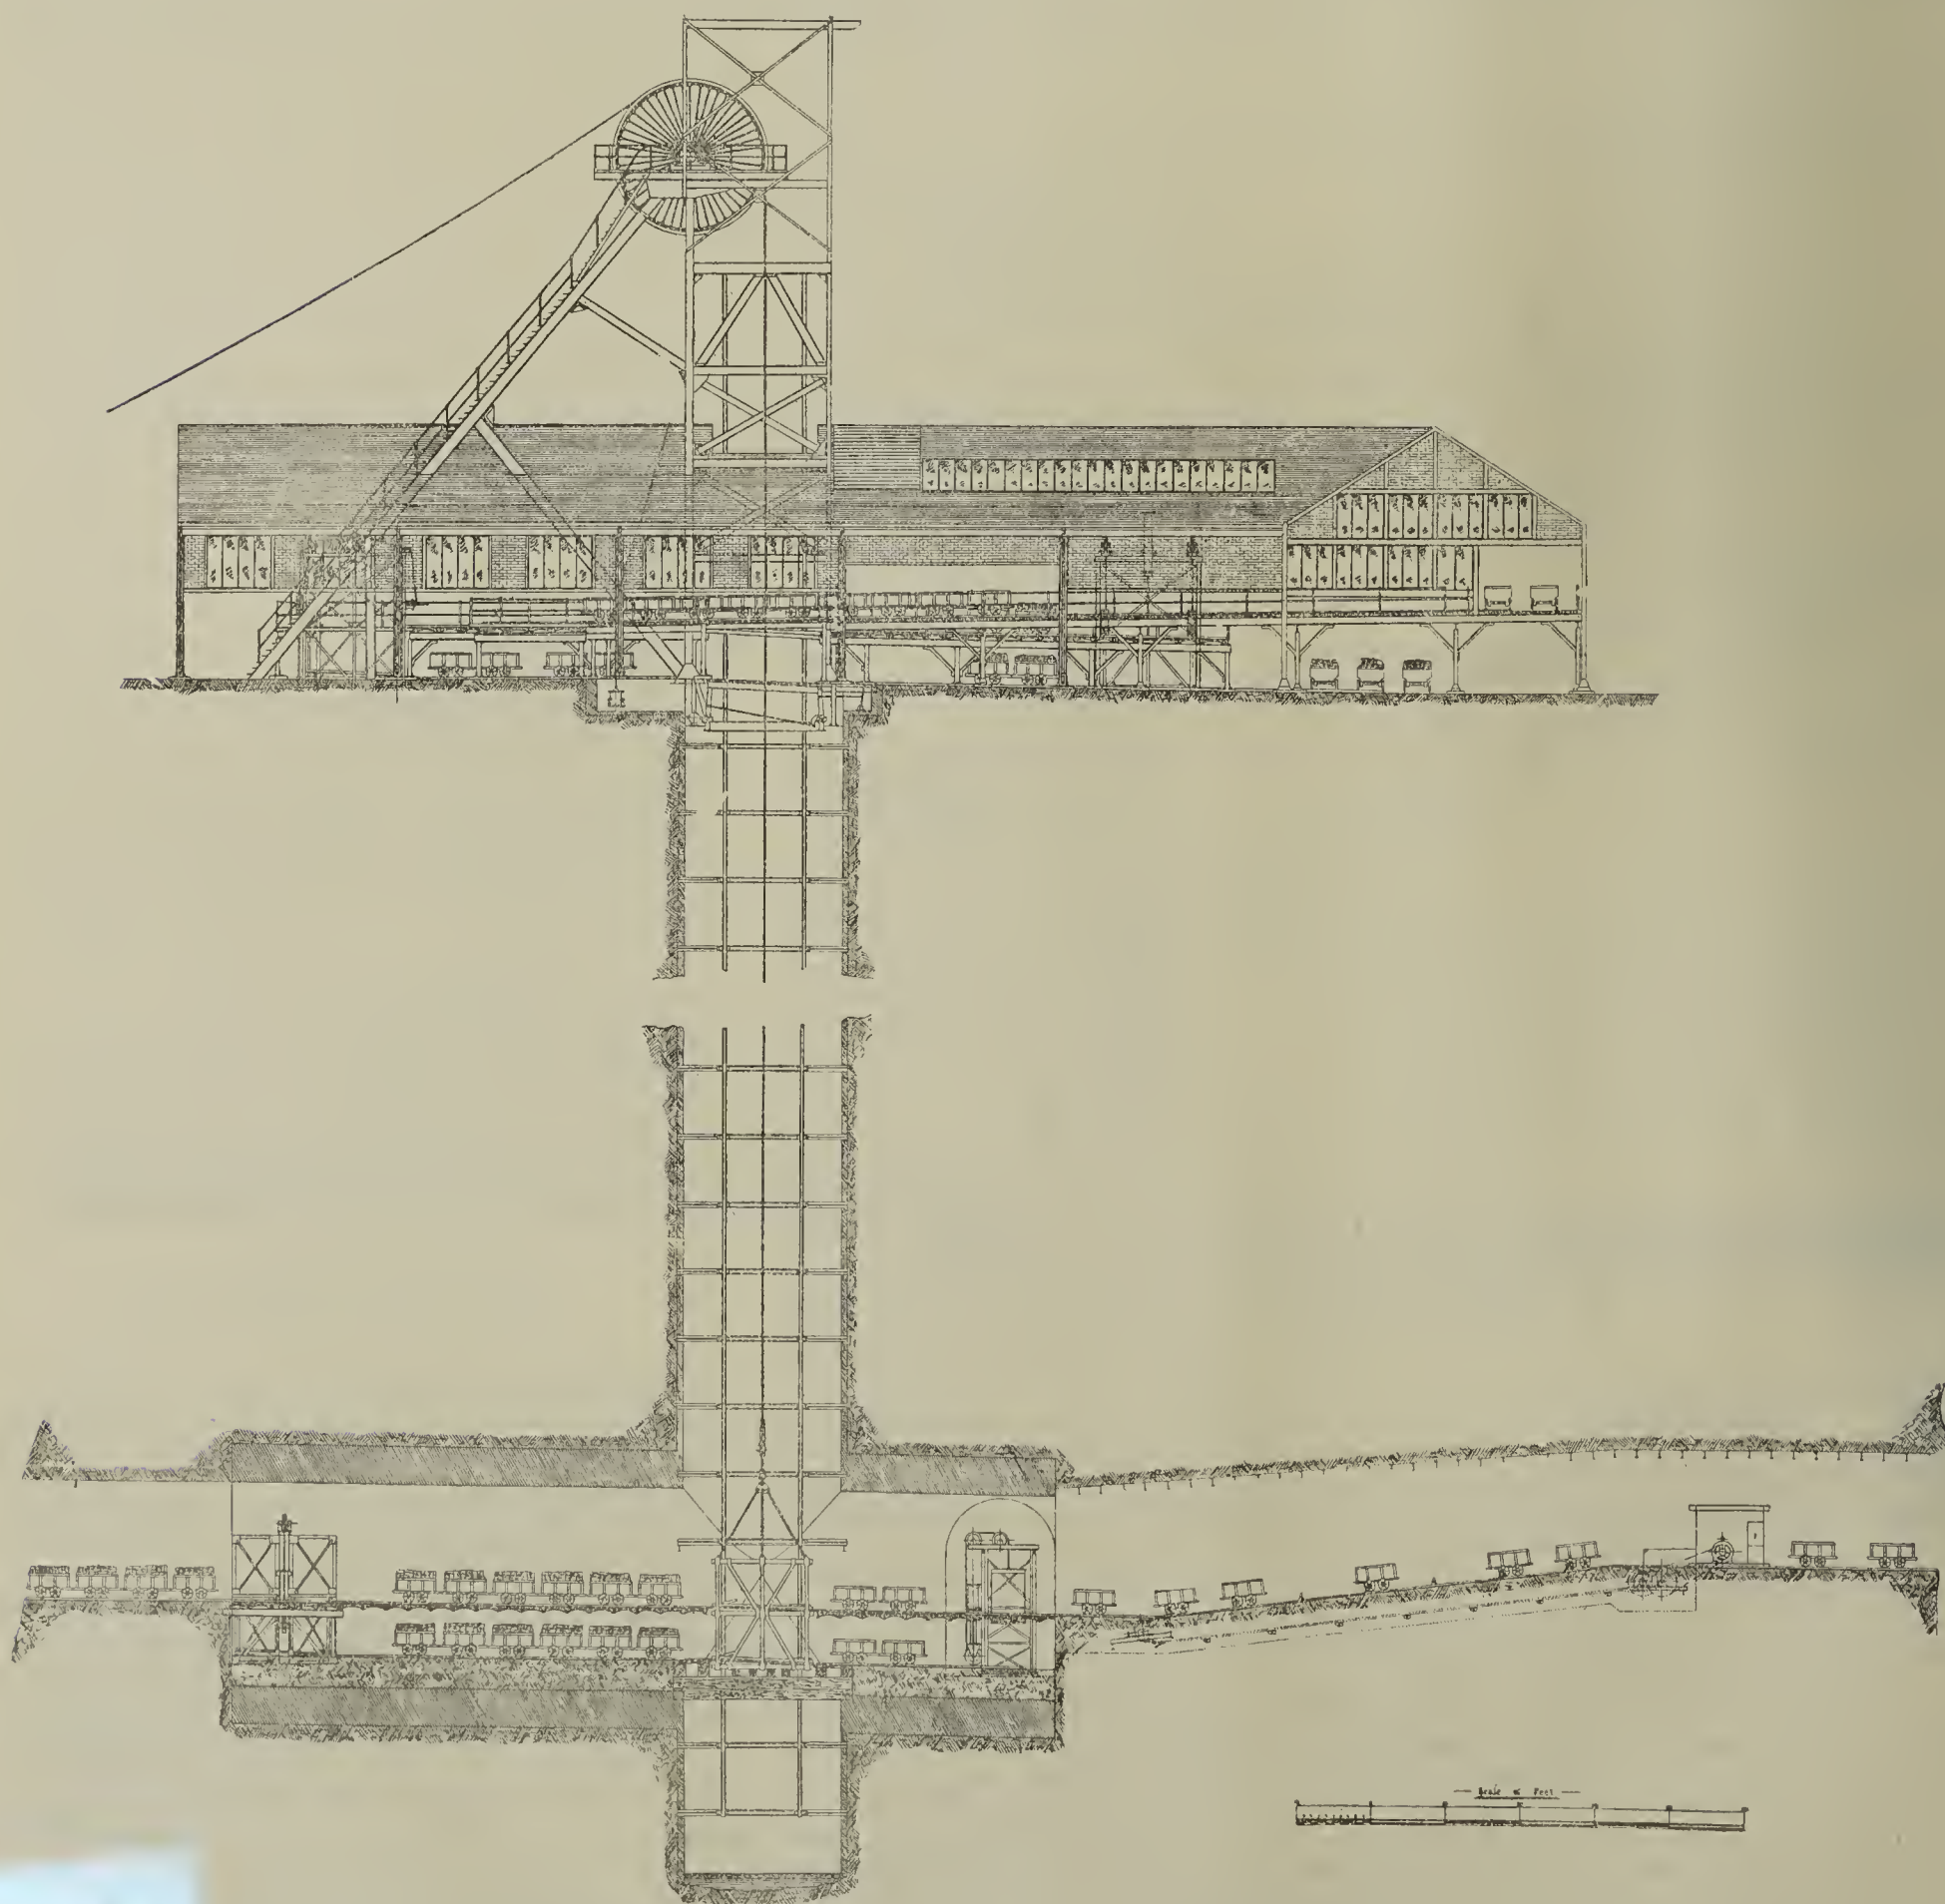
SOUTH PIT TOP AND SECTION THROUGH SOUTH PIT BOTTOM.
